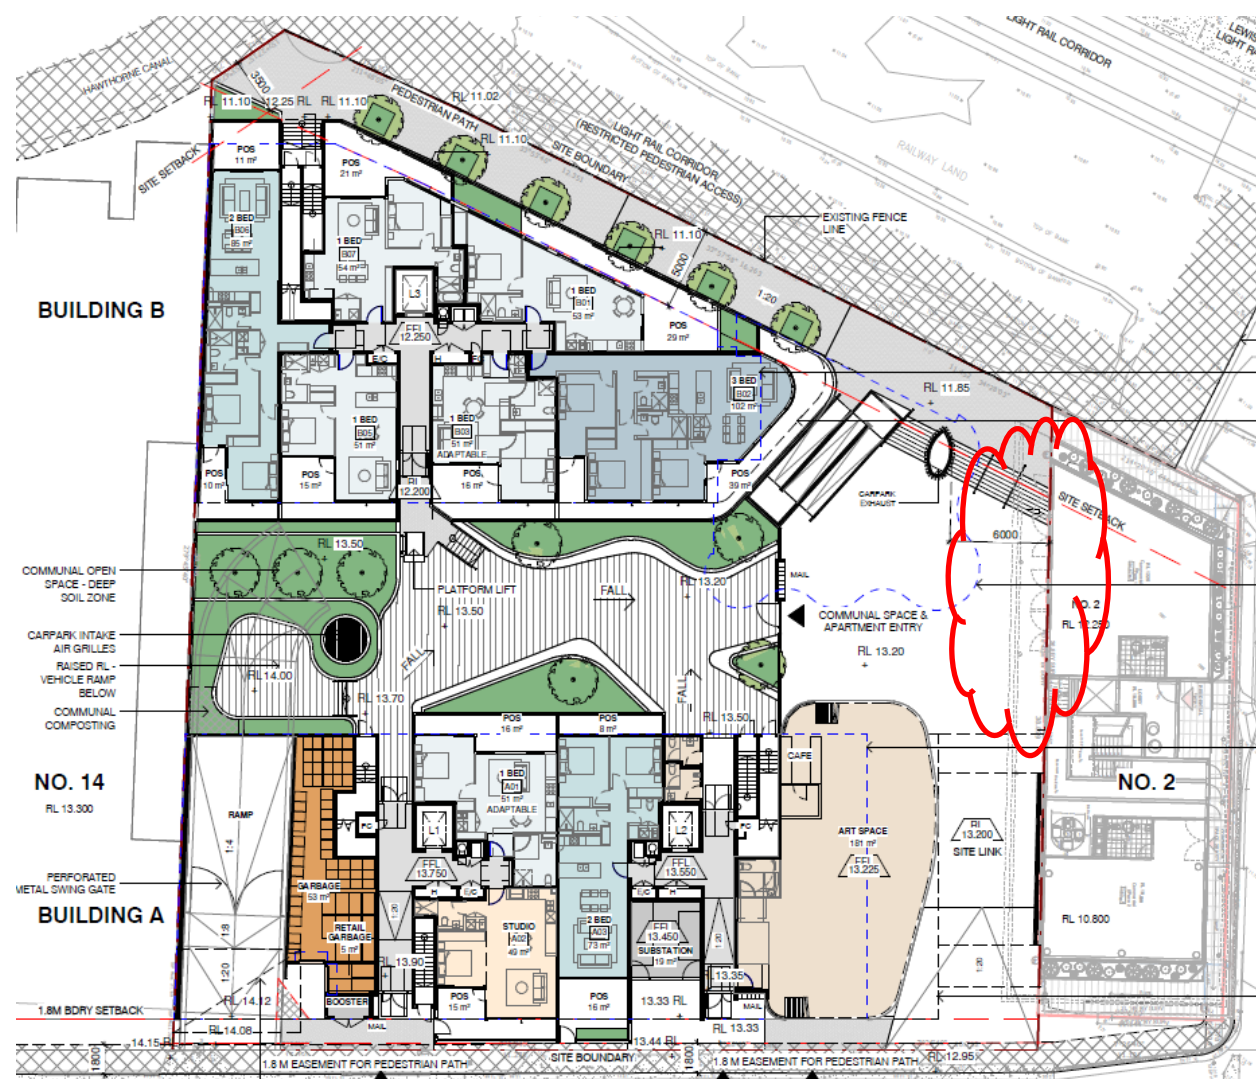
Ground Floor Plan illustrating 2 McGill Street Commercial Connection
